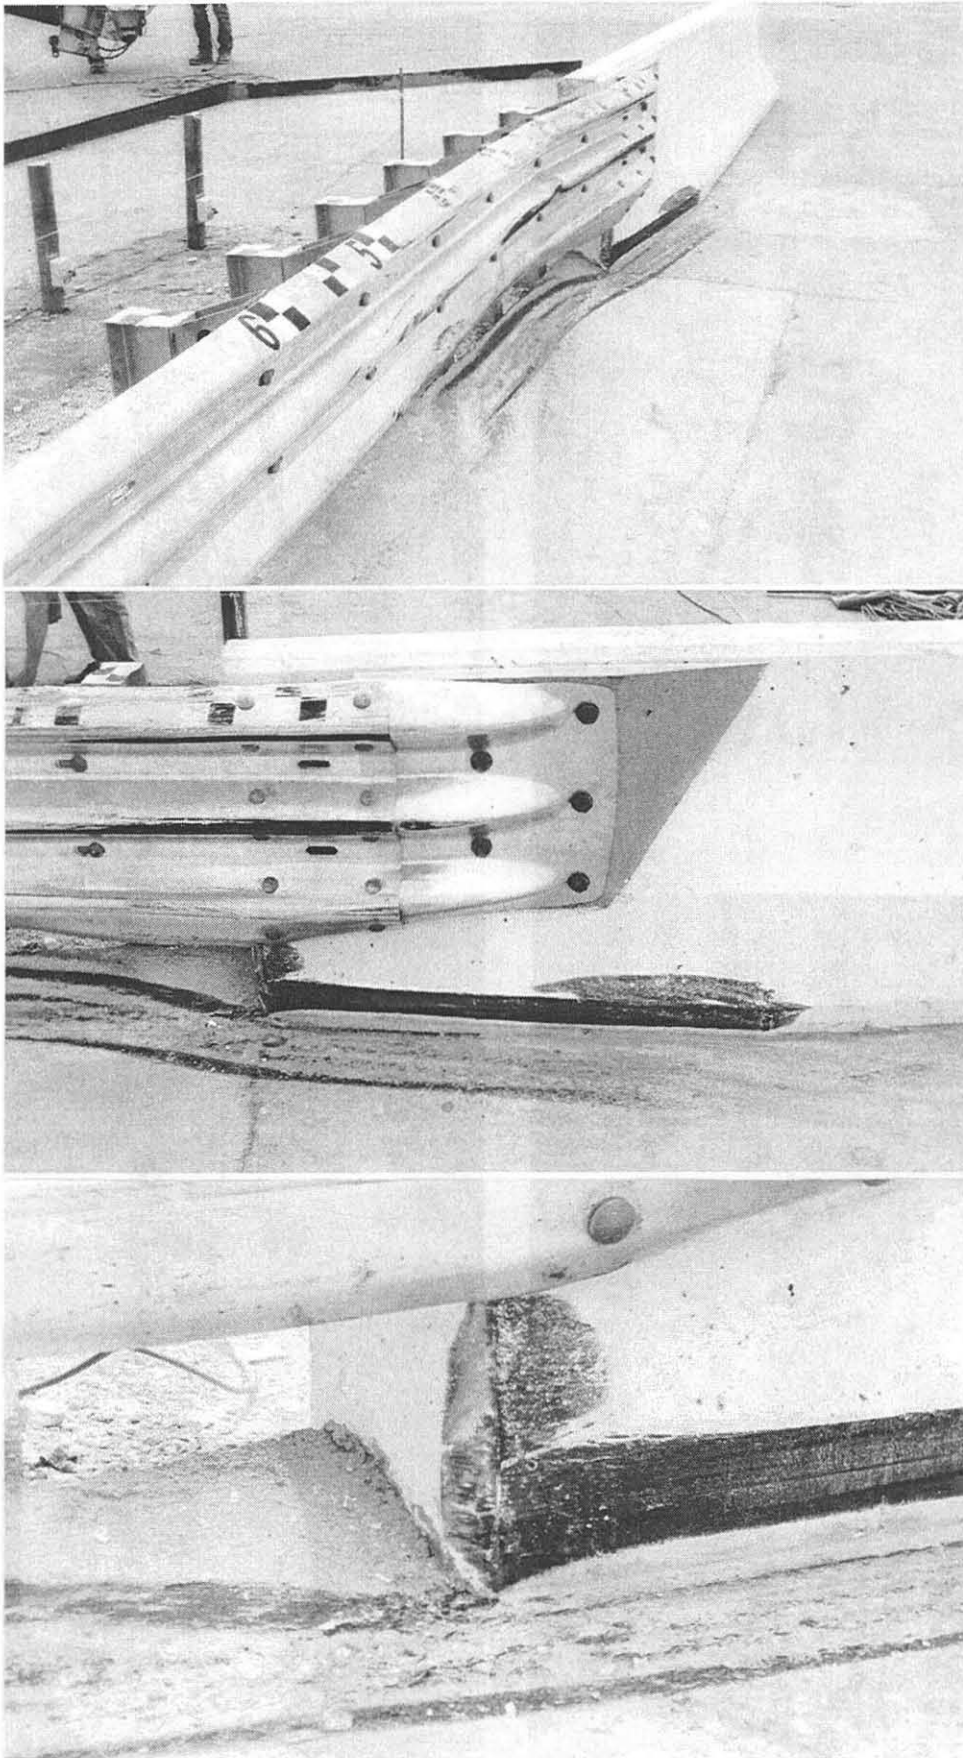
Barrier Damage, Test ITNJ-2 (Design No. 2)
